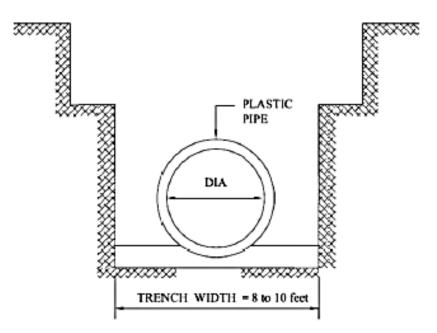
Stepped Trench used for 54-inch Diameter Pipe in Beehive Road Installation (Stuart et al. 2011)
